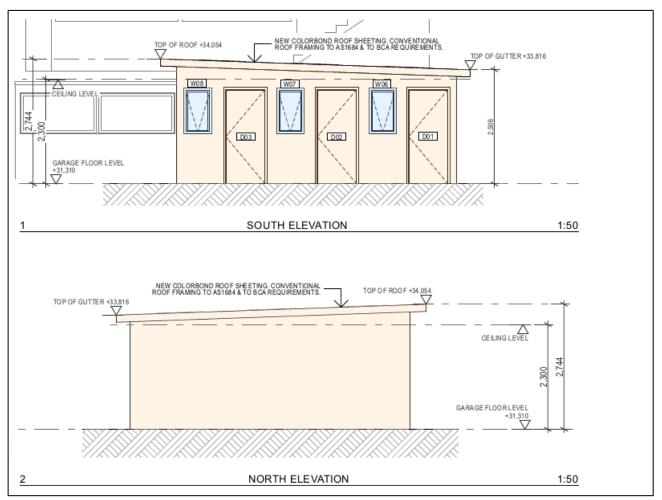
Proposed new rear garage with laundry facilities. Source: PlanShop.
